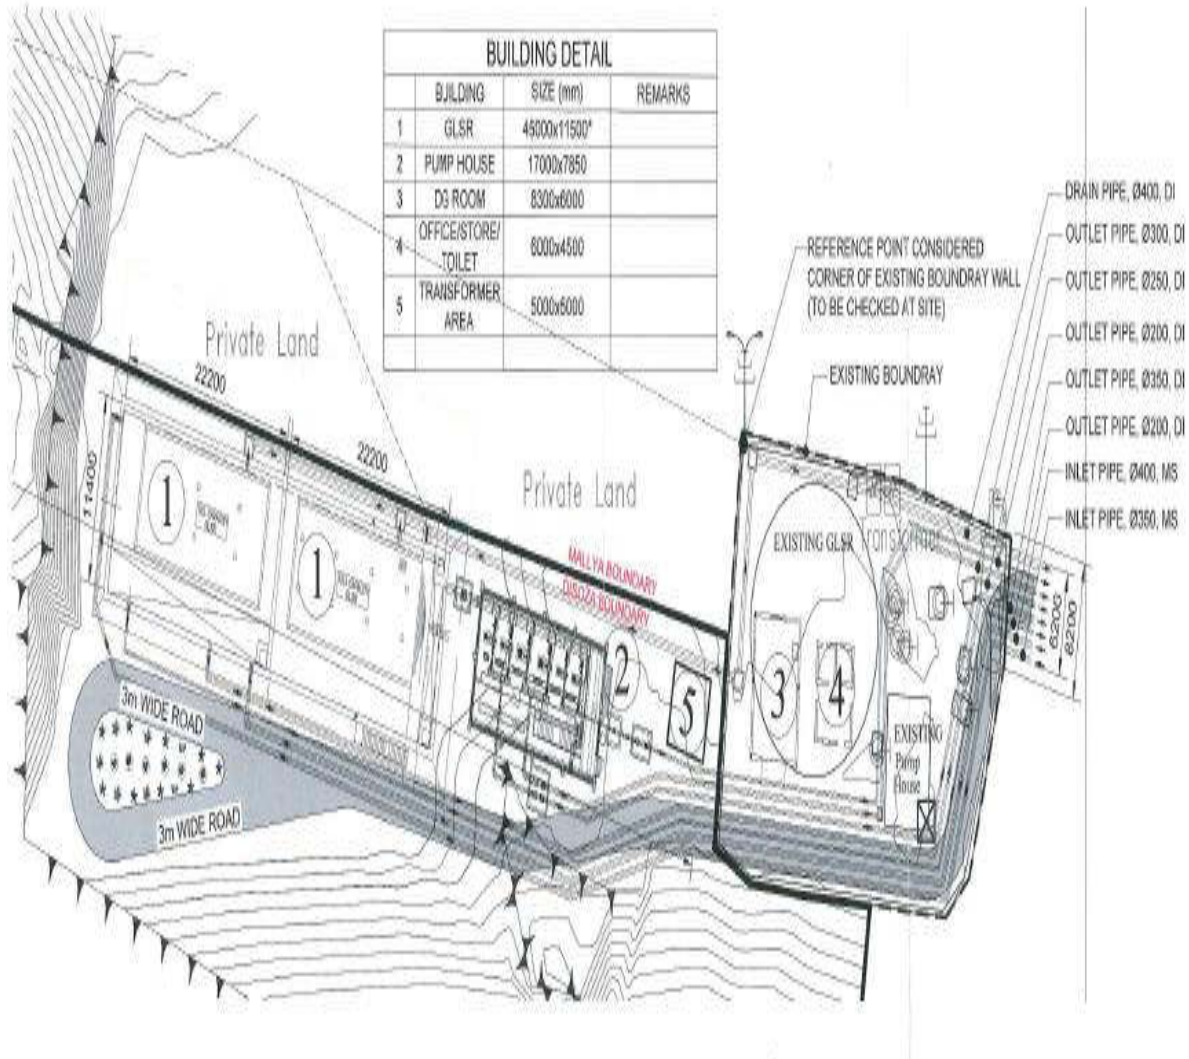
Proposed WTP Layout PlanTable 4: Details of WTP
